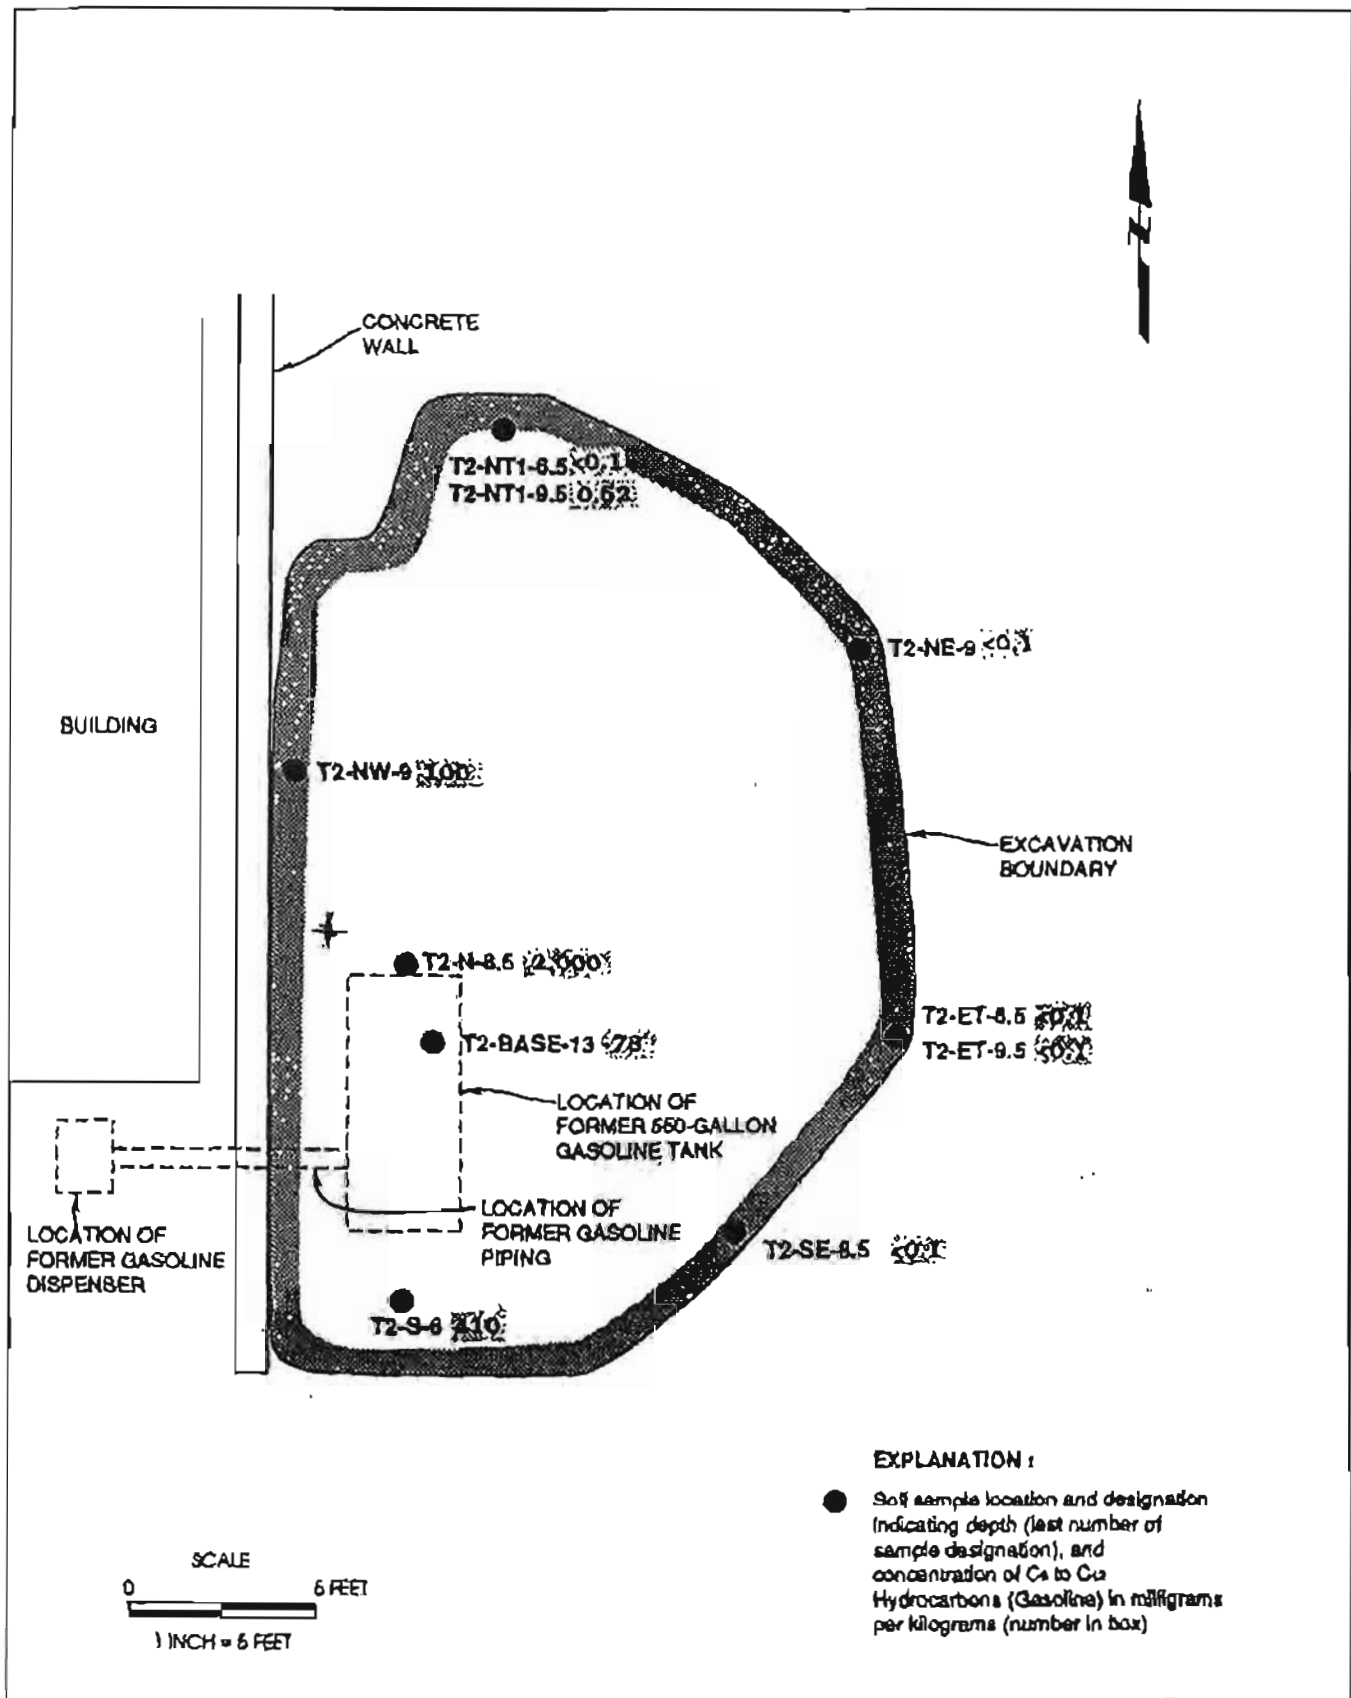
SITE PLAN SHOWING FORMER TANK LOCATION, EXCAVATION AND SOIL SAMPLE LOCATIONS
